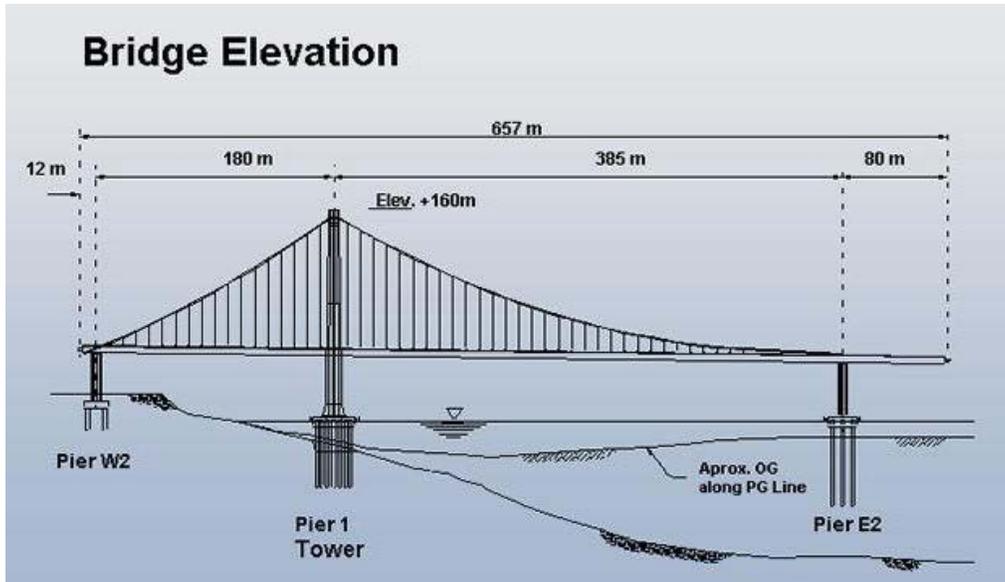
Elevation of the SFOBB Self-Anchored Suspension Bridge.
